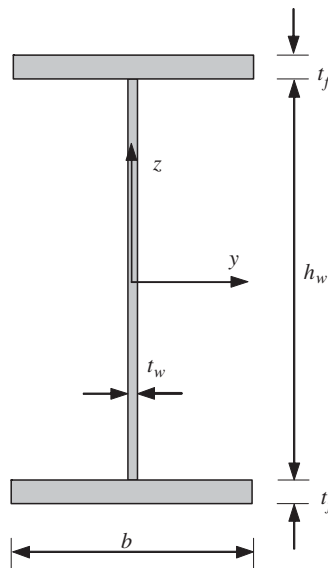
Example 3: Cross-section of the Steel I-section beam.
